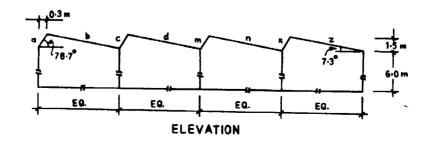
BUILDING WITH MULTISPAN SAW TOOTH SPEED ROOF (Continued)
